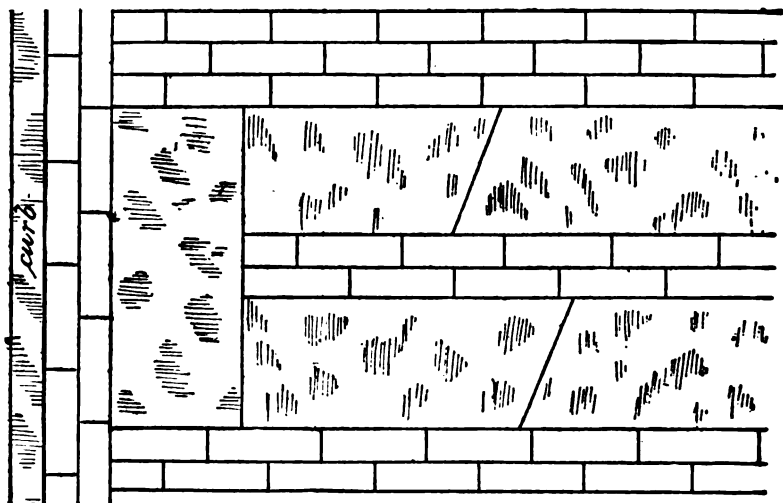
PLAN OF CROSSING, SHOWING BEVELLED JOINTS.
